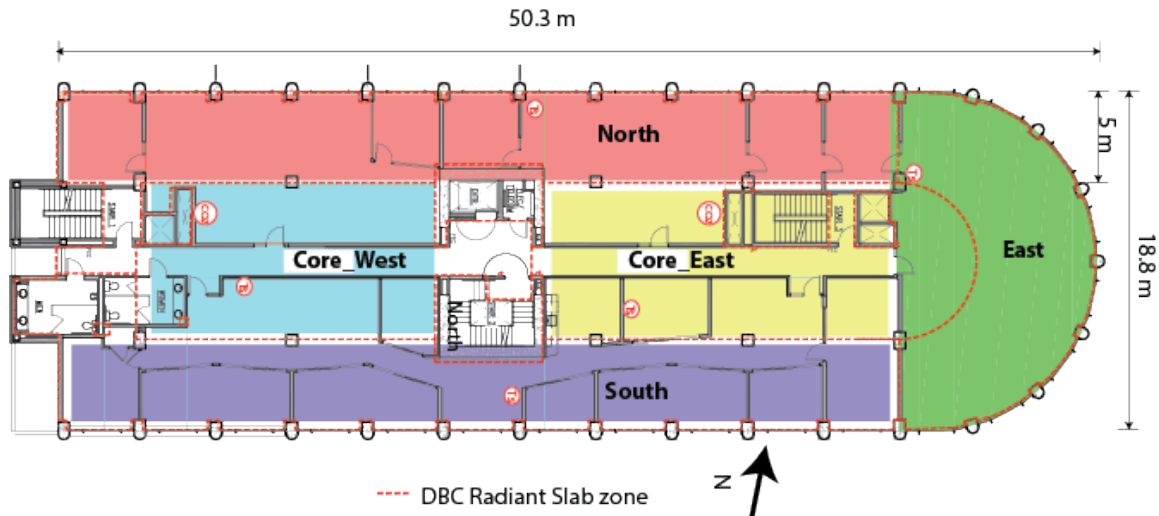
Typical floor plan of DBC building and radiant system zoning
